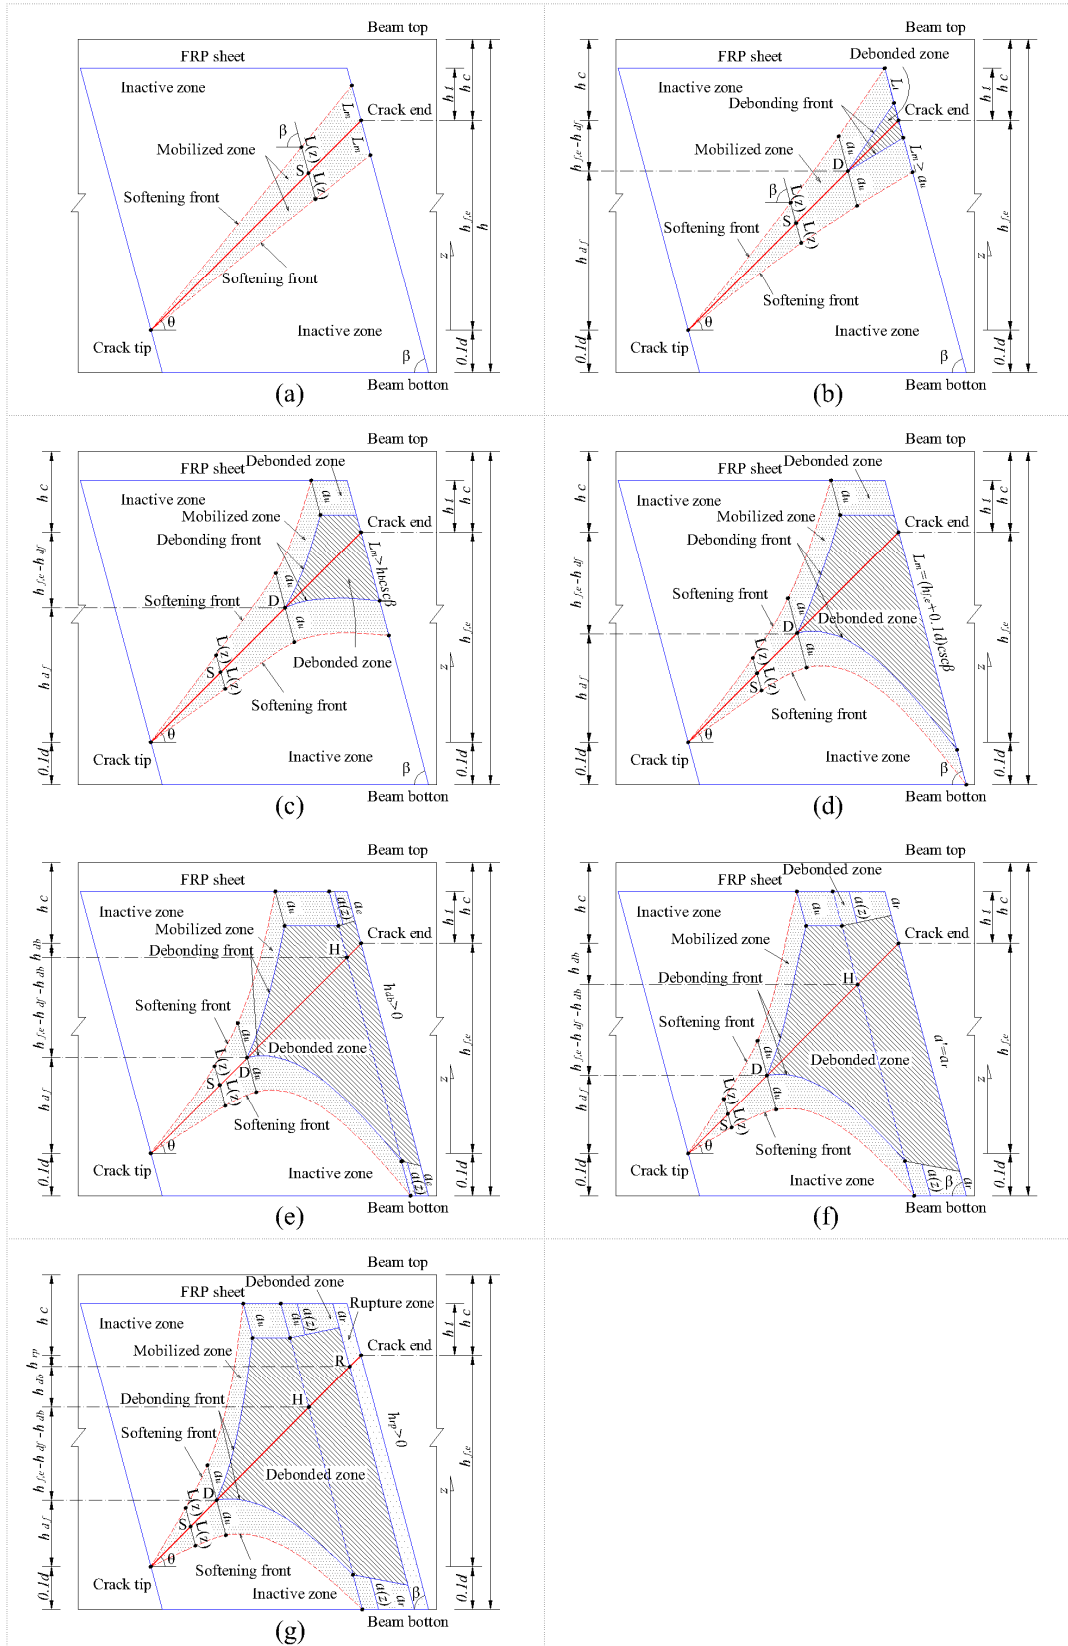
Failure process of FRP wrap for a thick concrete cover.
